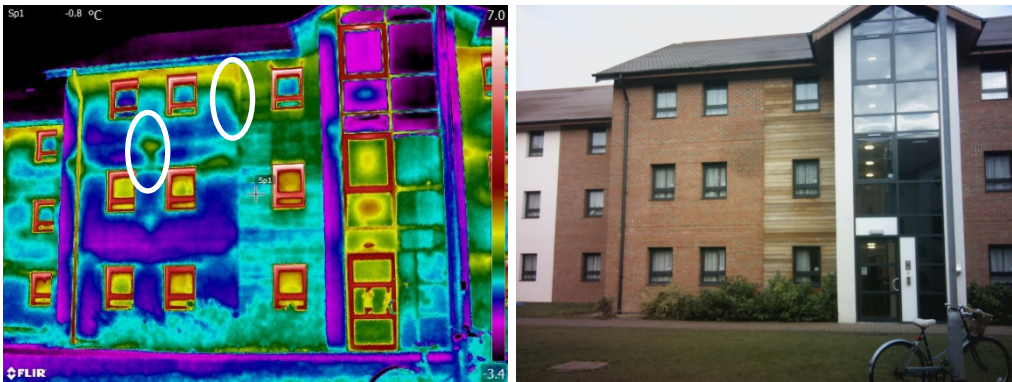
(left): IR thermal image of brick and timber clad wall, plumes marked
